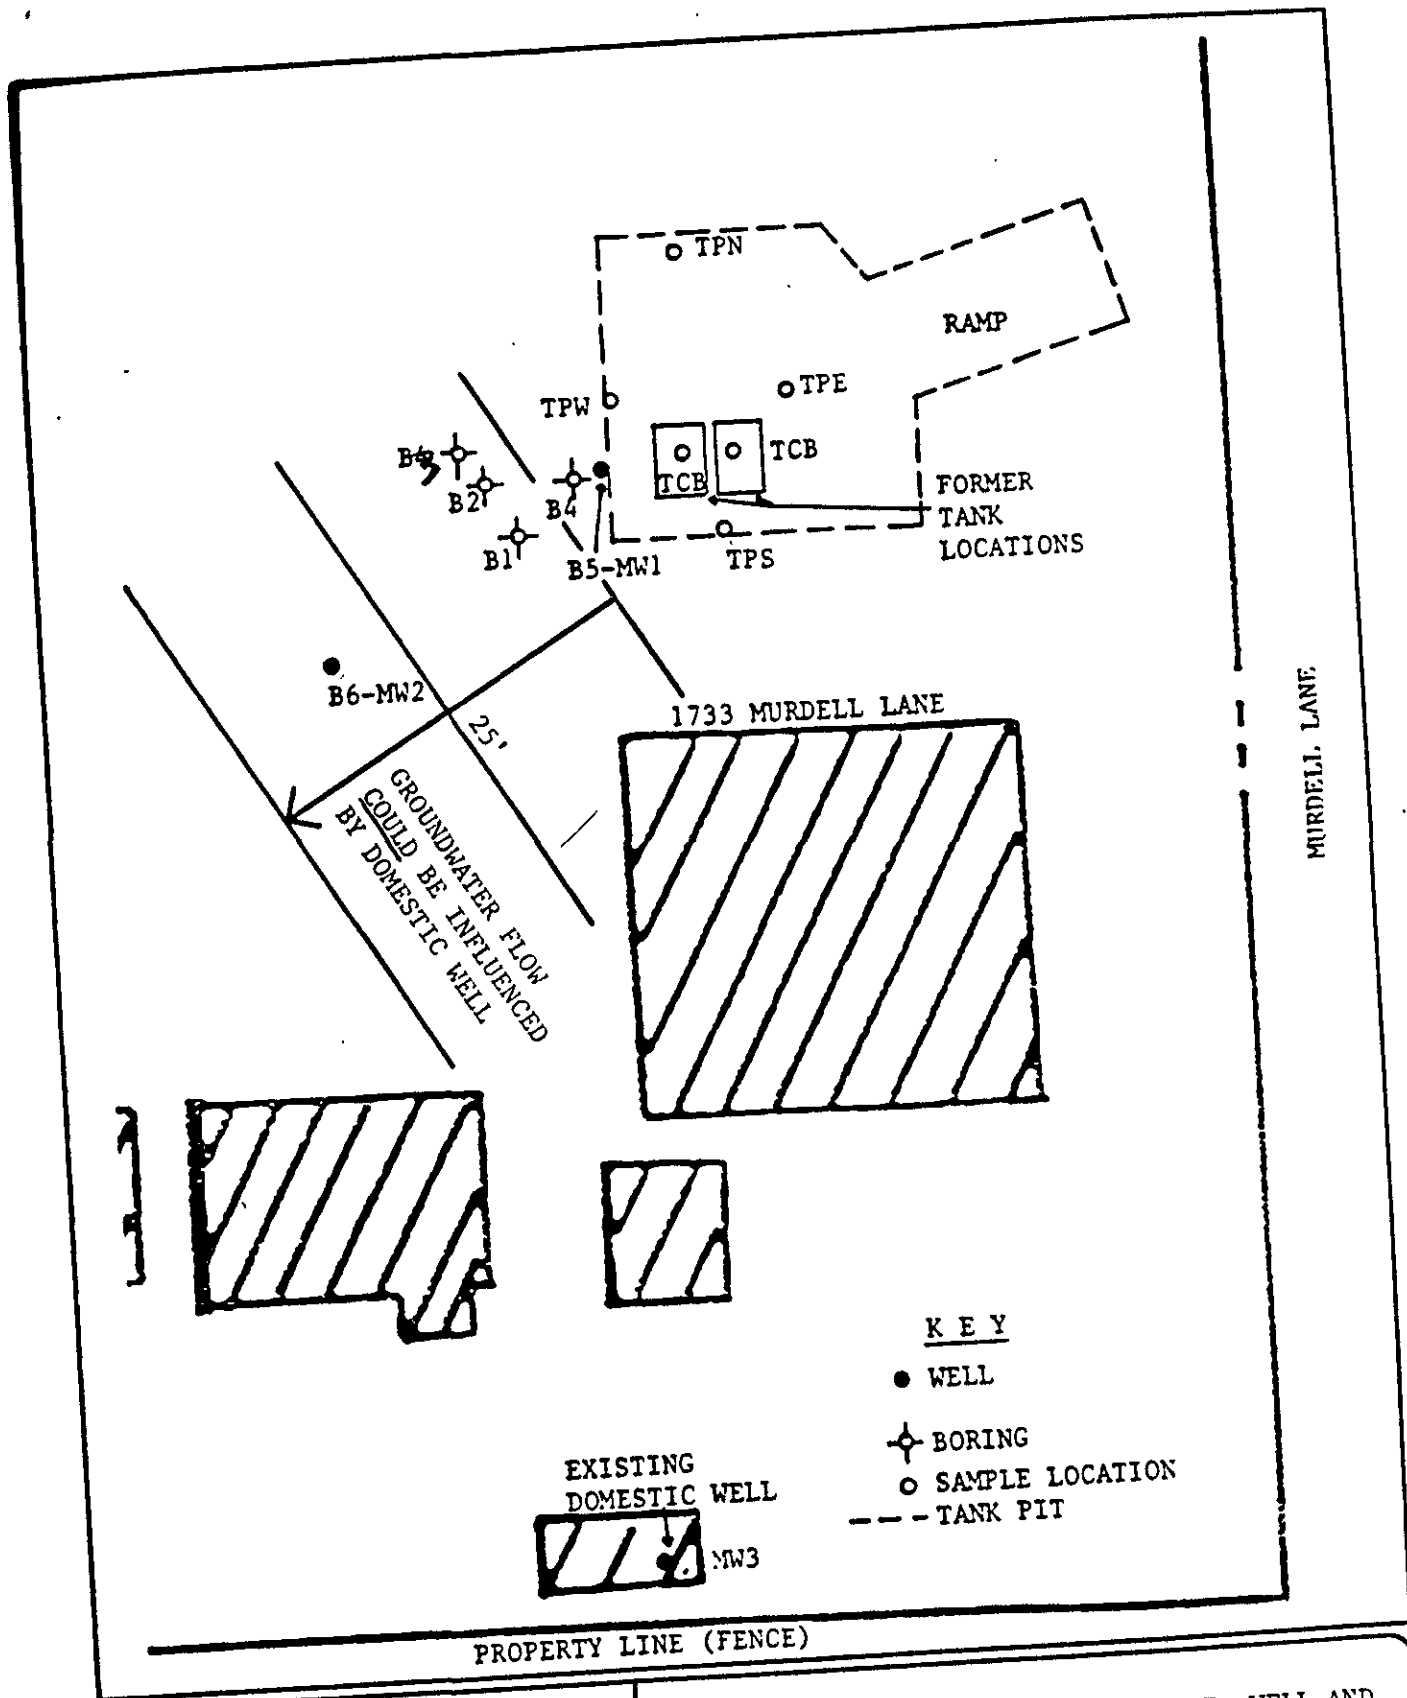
SITE PLAN WITH PIT, WELL AND BORING LOCATIONS AND GROUND-WATER DIRECTION
